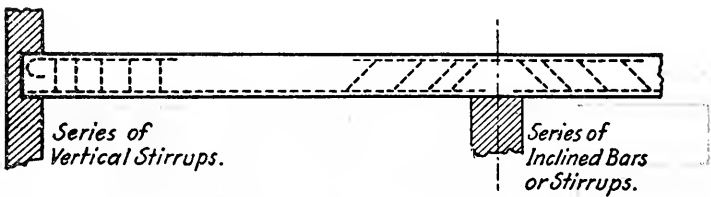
Typical Reinforced Concrete Beam Without Special Anchorage; Web Reinforced by Means of Series of Vertical Stirrups or Series of Inclined Bars or Stirrups
